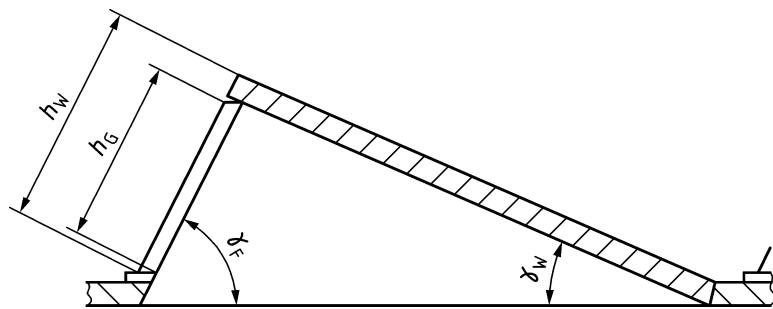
Dimensions used to describe the geometry of shed roof lights
